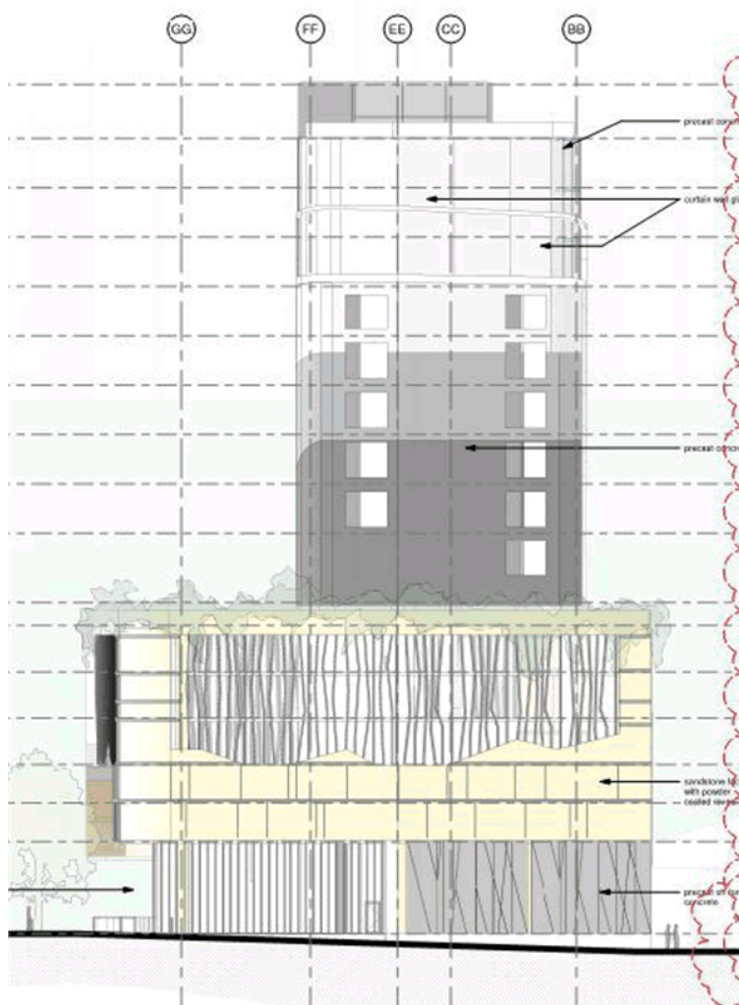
Ragged Lane Elevation (Excerpt from proposal plans).
